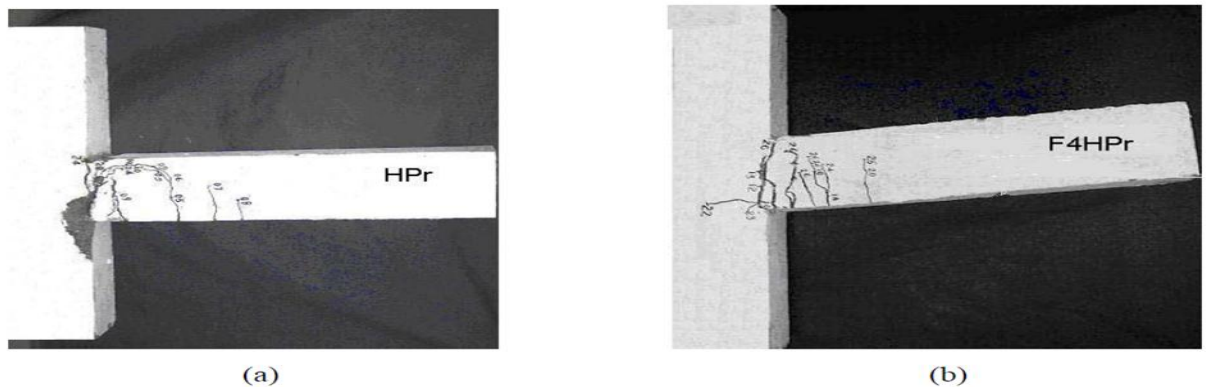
(a) HPC (high performance concrete specimen after failure; (b) SFRHPC (steel fibre reinforced high performance concrete) specimen after failure [29]
